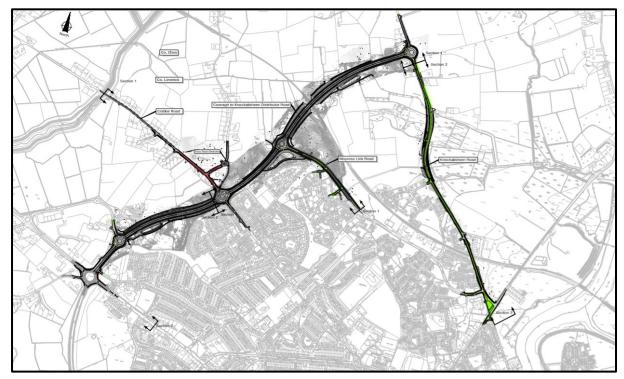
Plan of Coonagh to Knockalisheen Distributor Road
